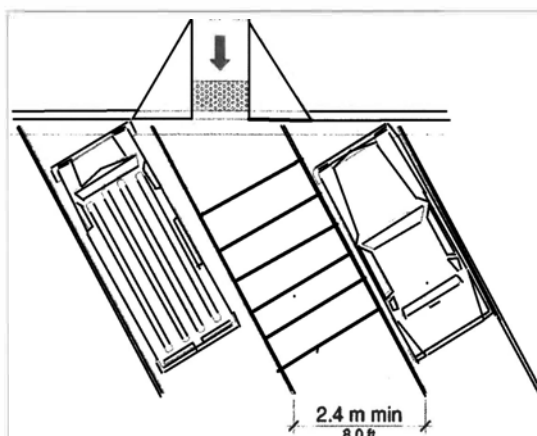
Accessible Angled On - Street Parking Spaces with Aisle and Ramp.
